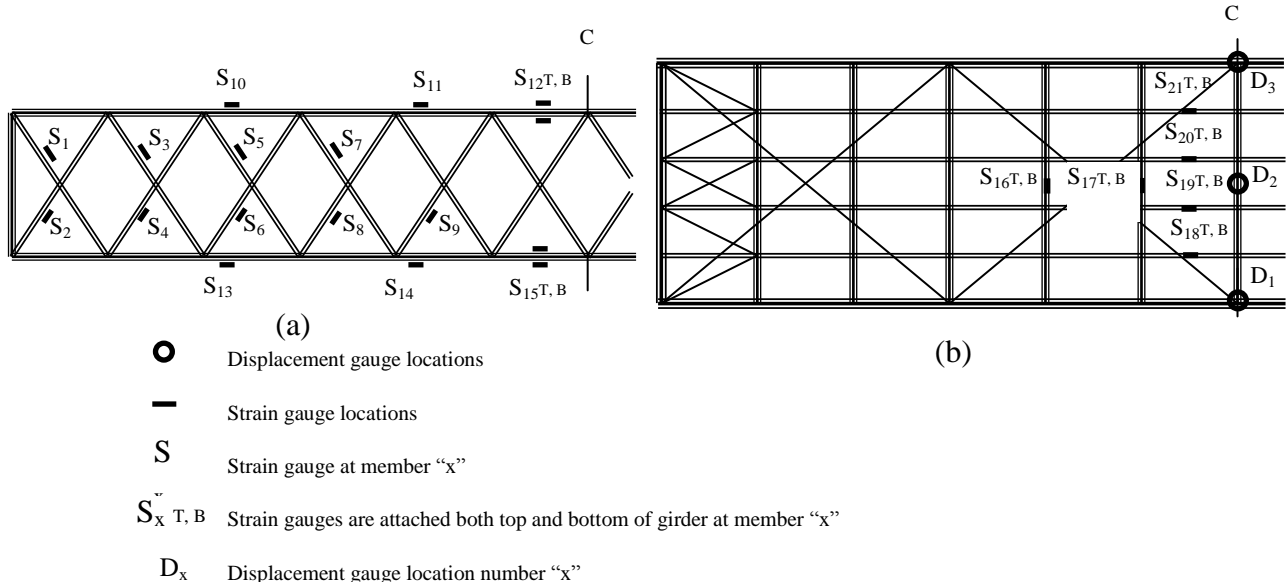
Locations of the strain gauges and displacement gauges (a) Main truss girder (b) Horizontal bridge deck
